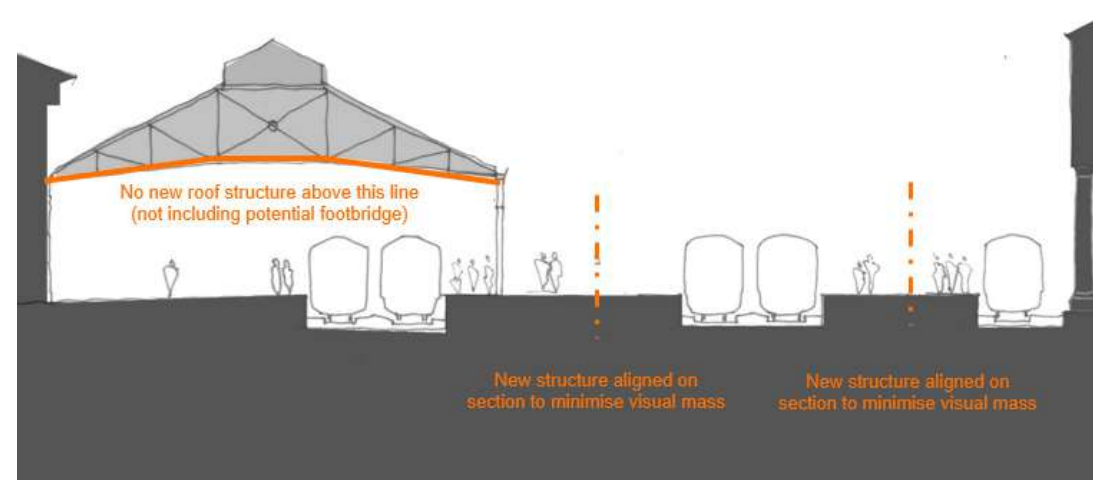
New structure kept clear of Roof A gable; columns aligned on platform
